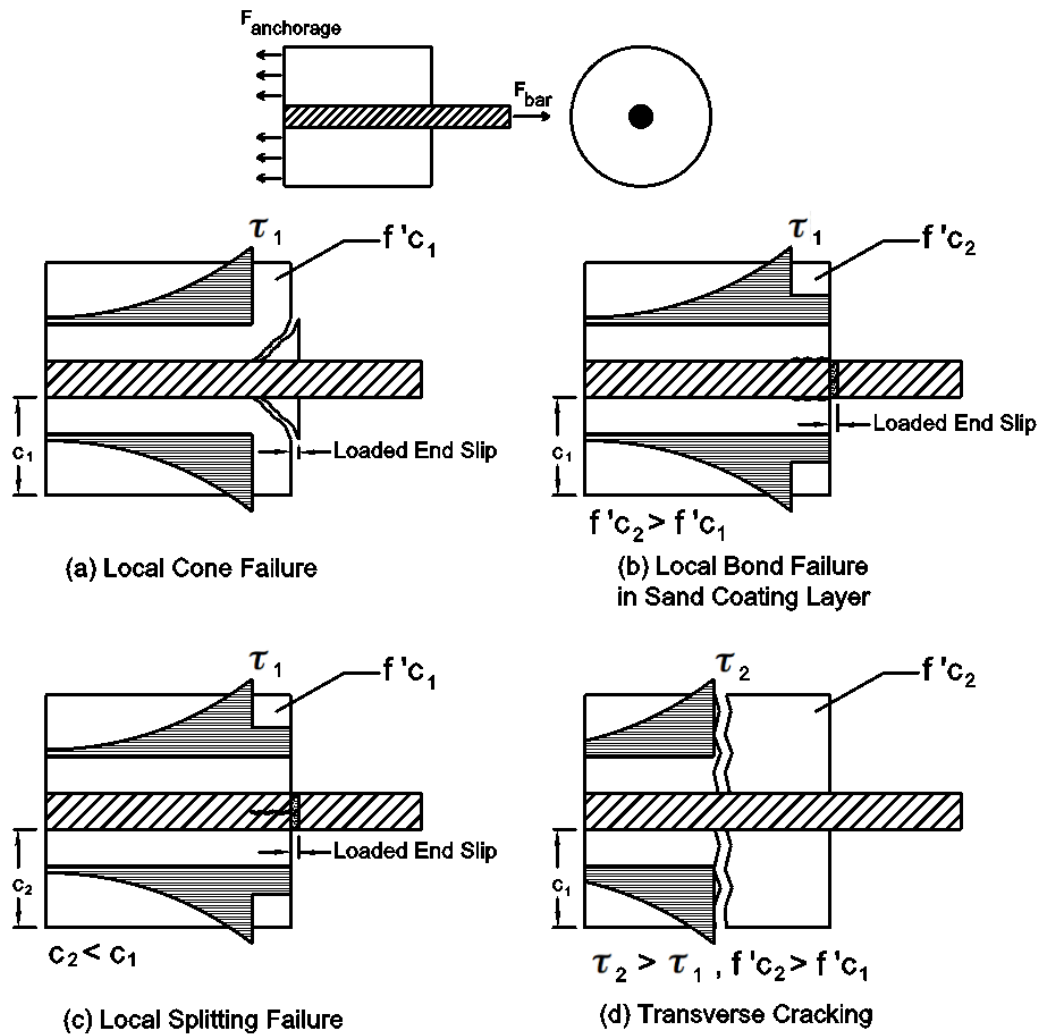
Various types of failure modes and excessive loaded end slip conditions for modified pullout tests
